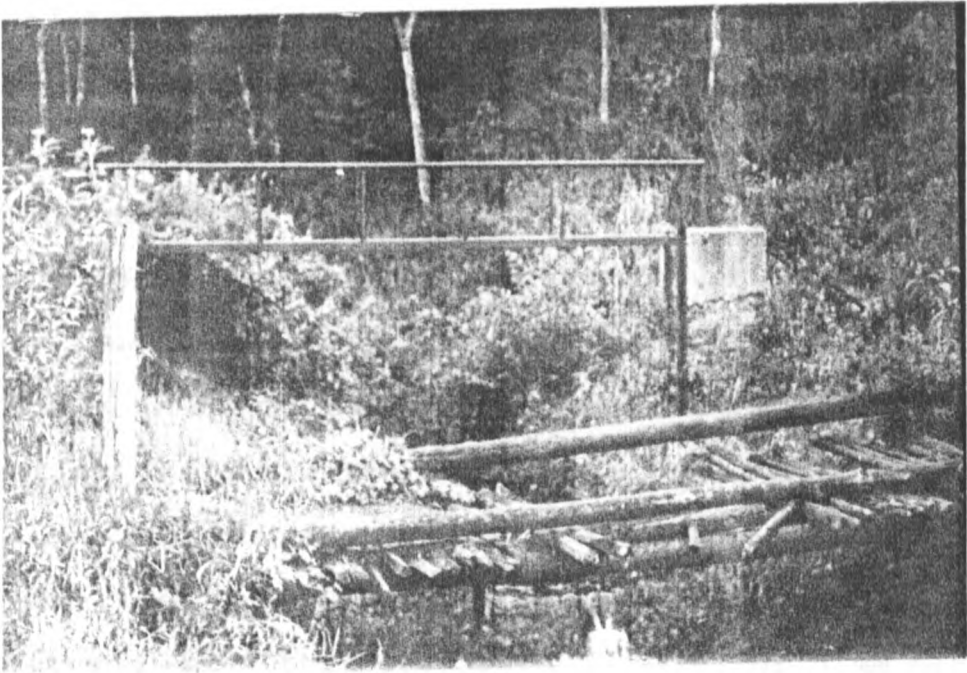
An old wooden bridge with the constructed upper steel bridge in the background.
